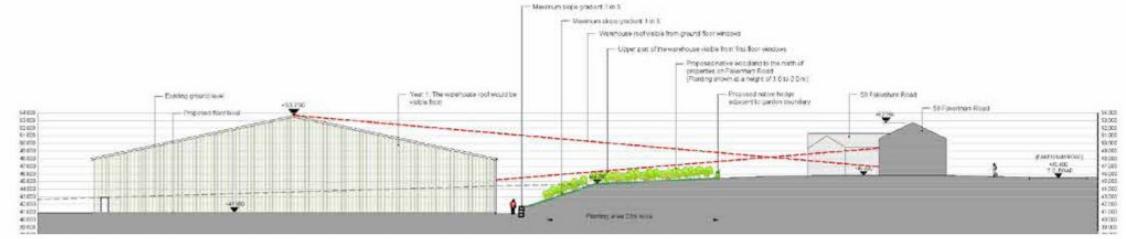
Section showing the proposed native woodland between the proposed warehouse and the properties on Fakenham Road, year 1.
